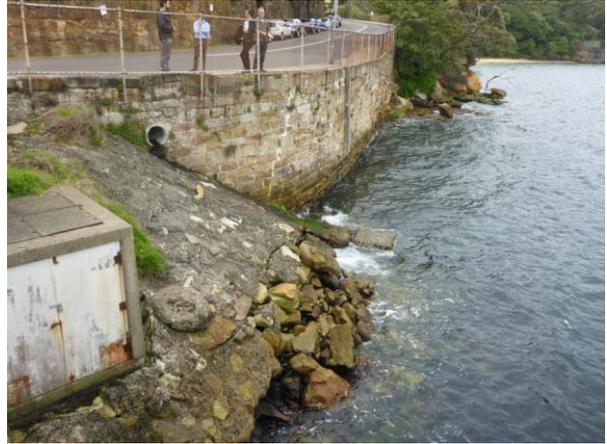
North-east facing detail view of sandstone retaining wall along Athol Wharf Road
